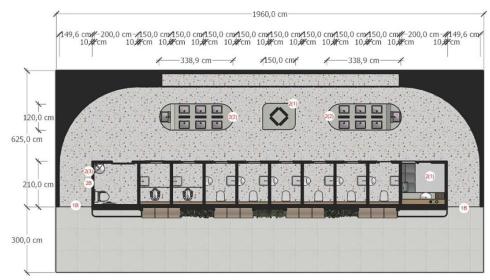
Layout Multi-Stalled Enclosed Space Toilet
